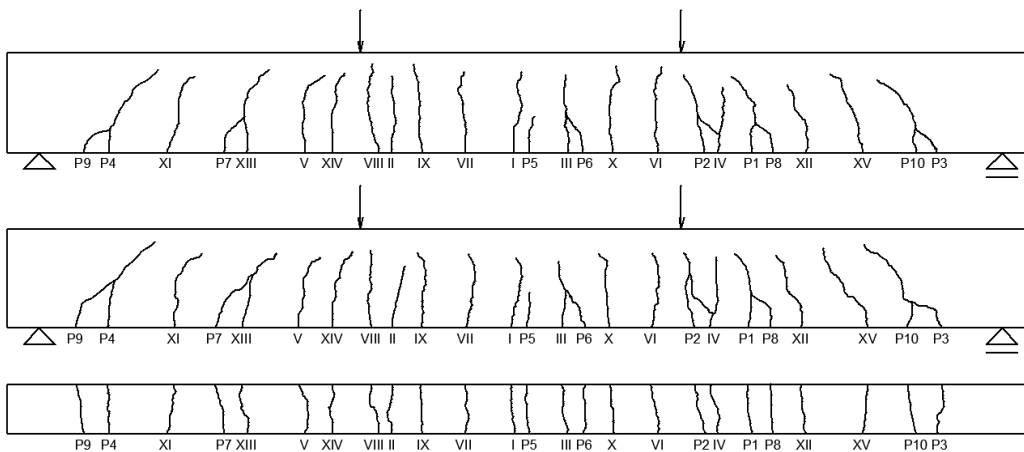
Scheme of cracks location on the bottom and both side surfaces of beam D1
